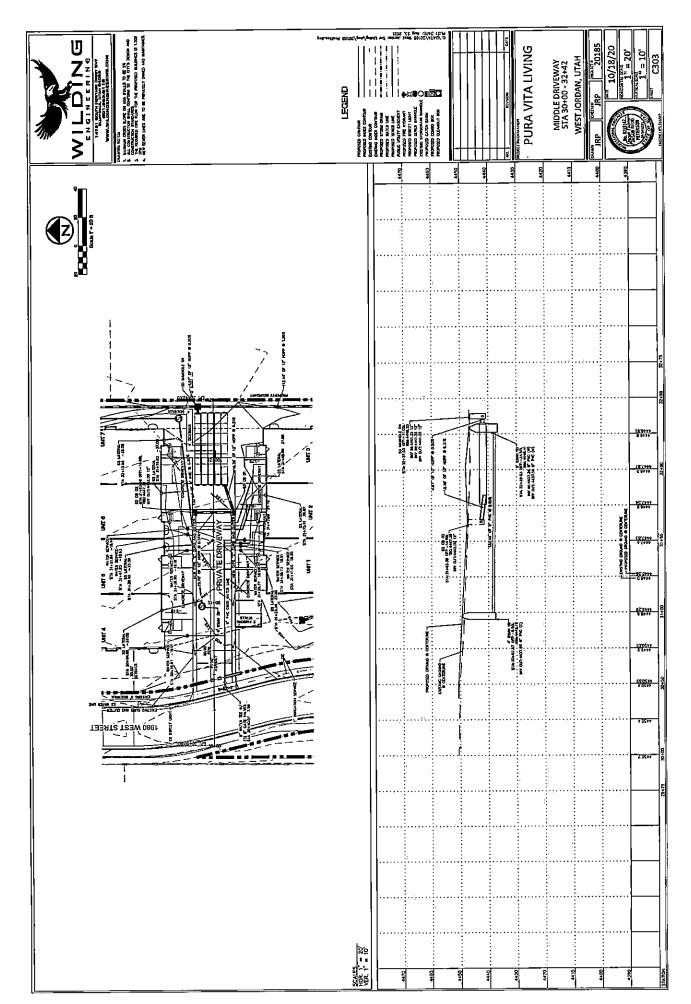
## EXHIBIT G OVERALL UTILITY PLAN AND GRADING AND DRAINAGE PLAN
